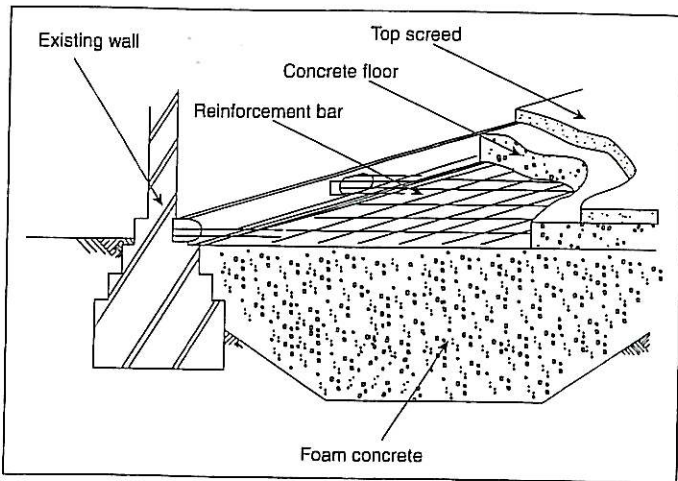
Diagram showing the use of foam concrete to upgrade a neglected farmhouse ground floor.
